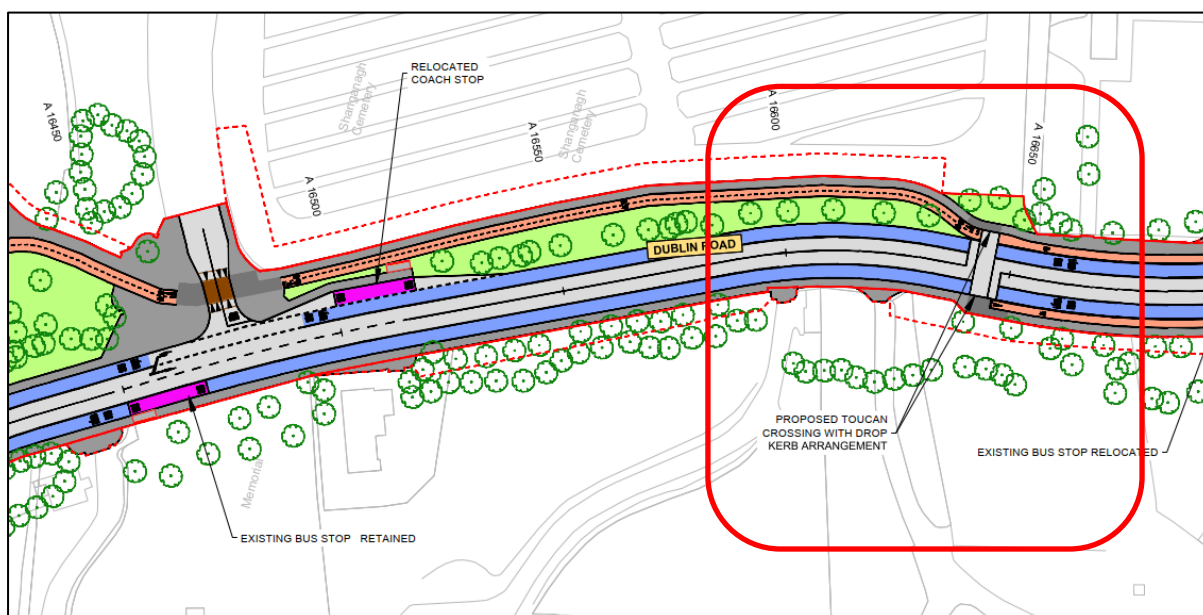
Extract from General Arrangement Drawings showing Proposed Toucan Crossing at Chainage 16+500 (Sheet 47)
